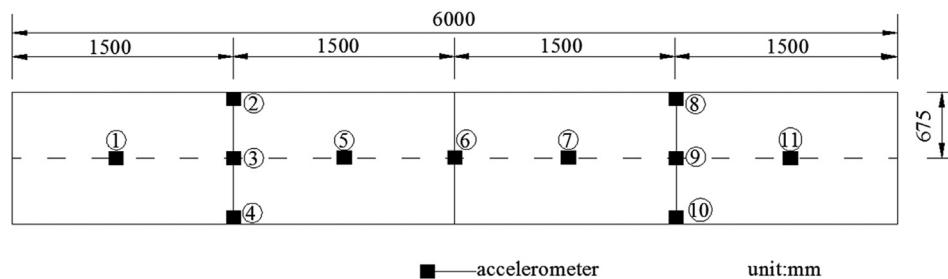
Measurement locations on the bridge deck in the modal test (unit: mm).
